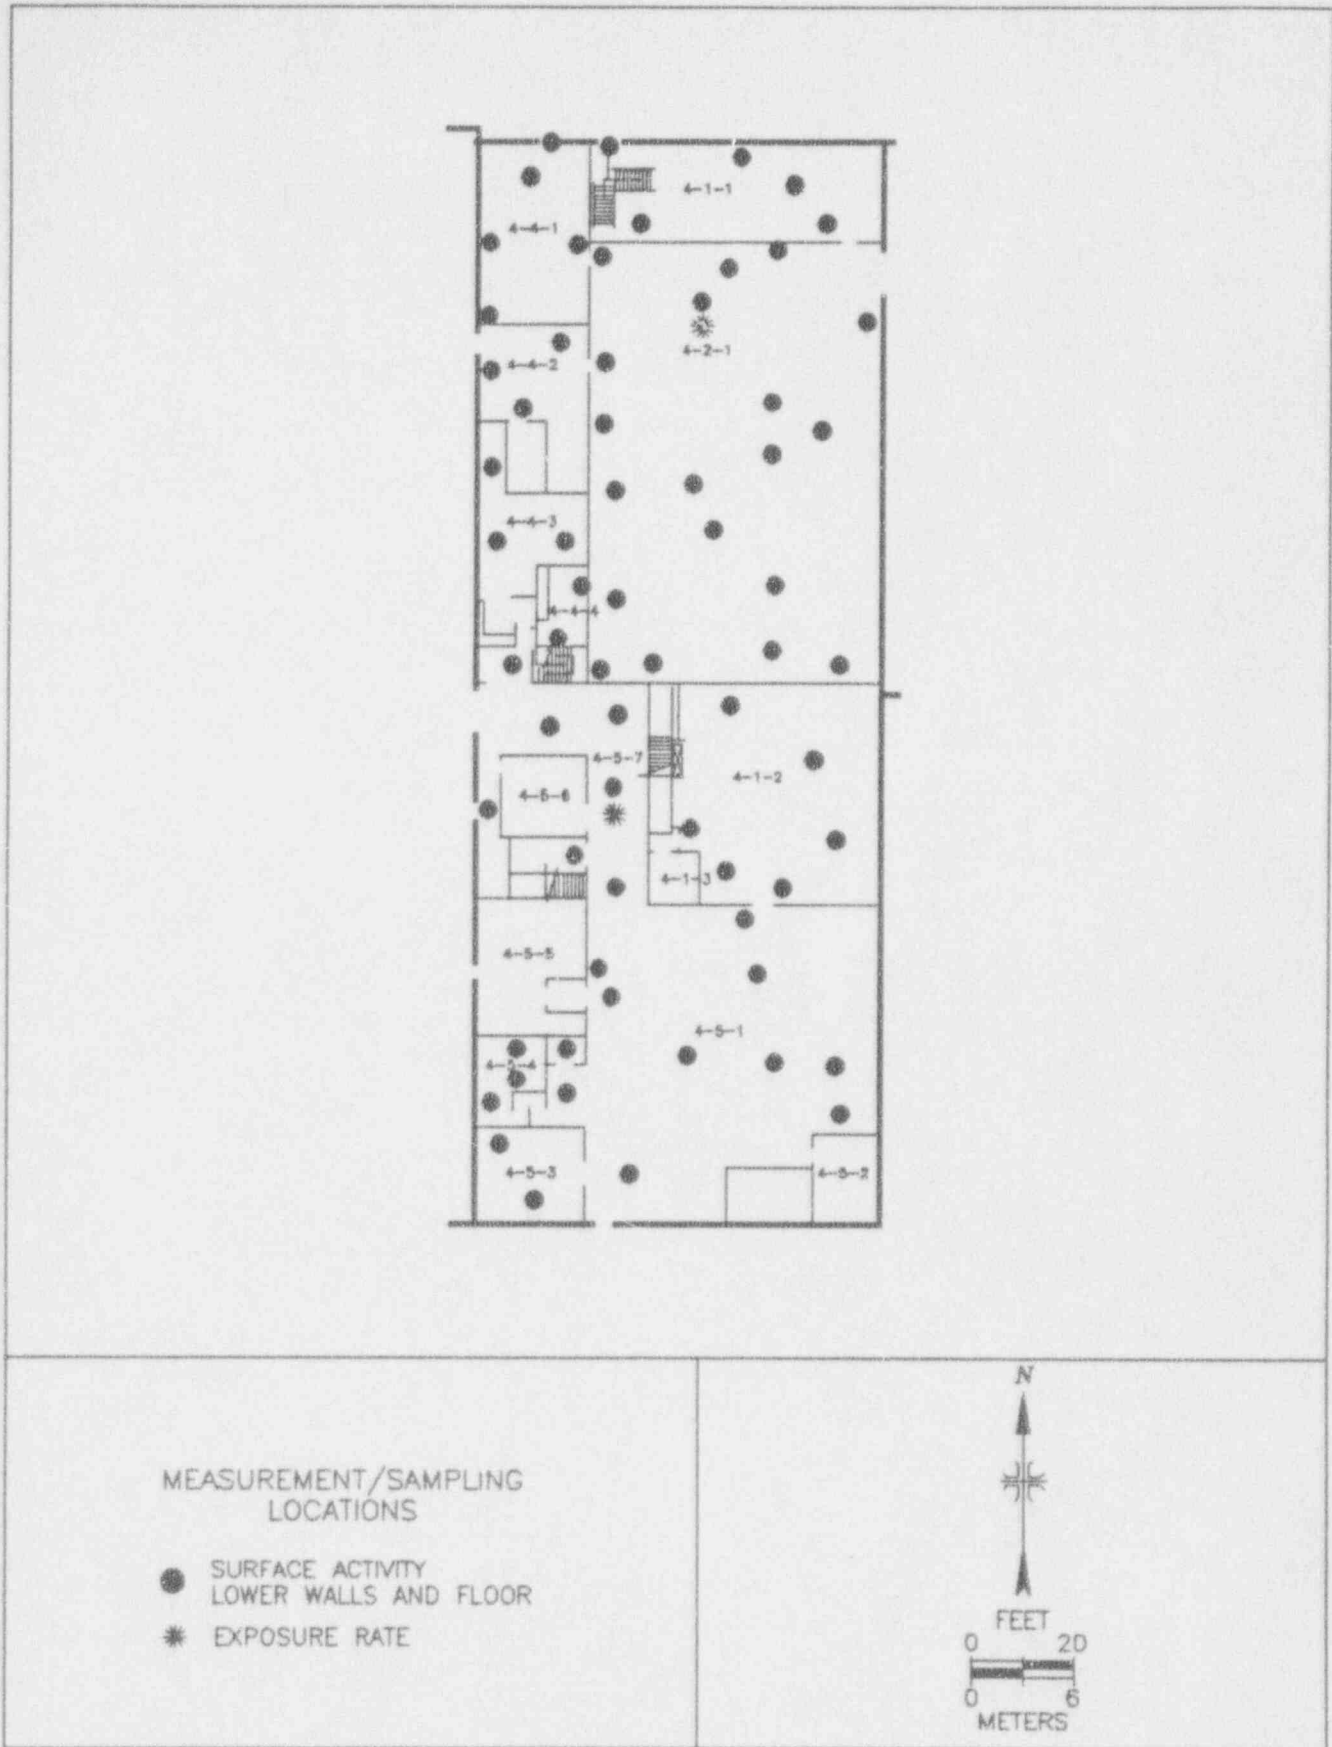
Building 6, First Floor – Measurement and Sampling Locations
